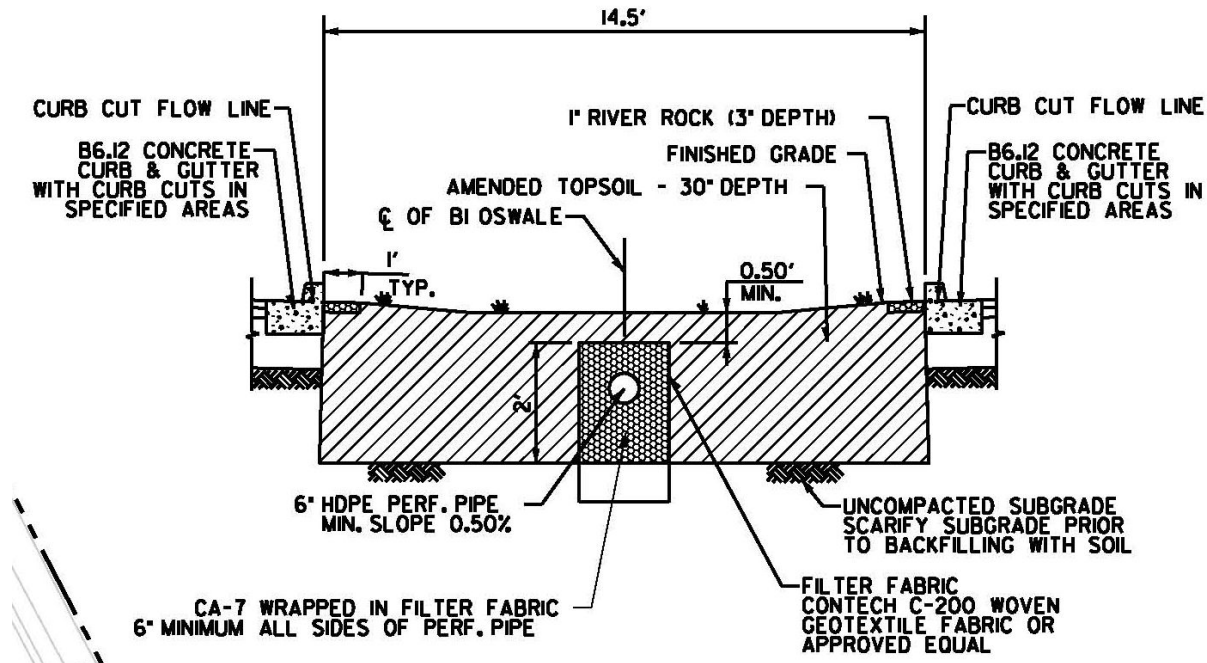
Construction detail of a bioswale (<https://www.warrenville.il.us/456/Bioswales>)
